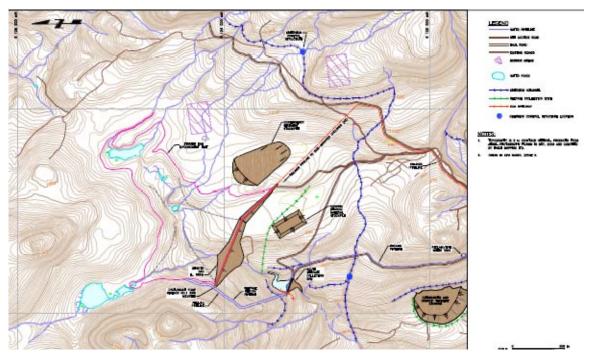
Location Plan – Contingency Sediment Stockpile
